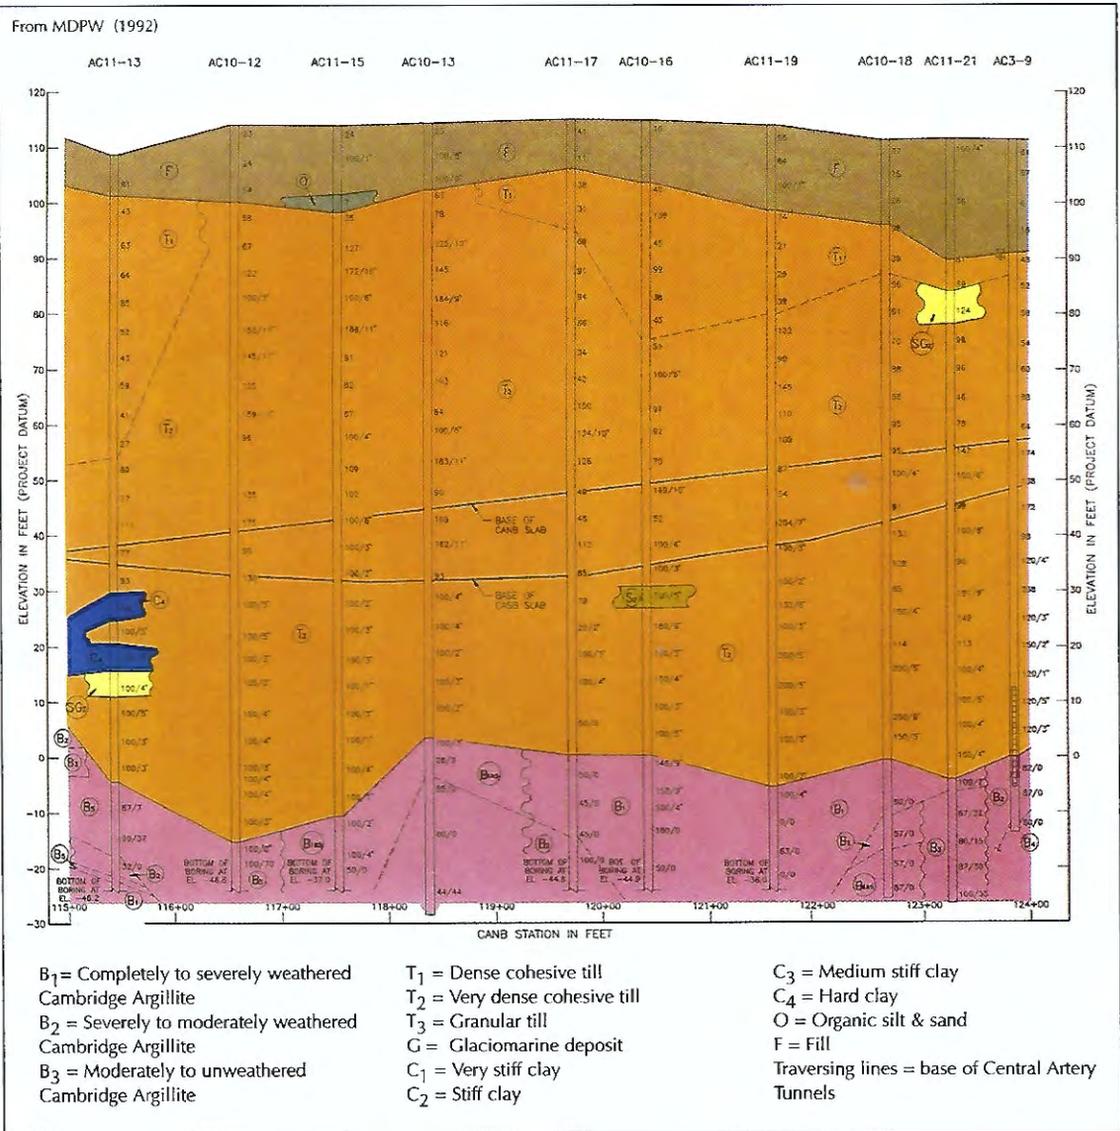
Section along the Central Artery Tunnel from Congress Street to Fleet Center near the Charles River, middle slurry wall between Stations 115+00 and 124+00 (view west to southwest).
